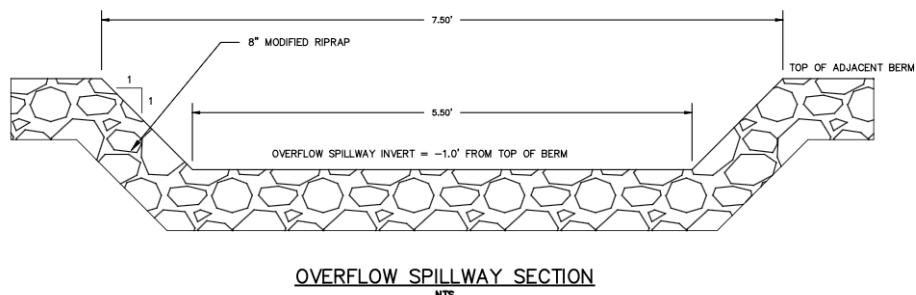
Figure 3: Site plan detail of repairs to overflow spillway.
